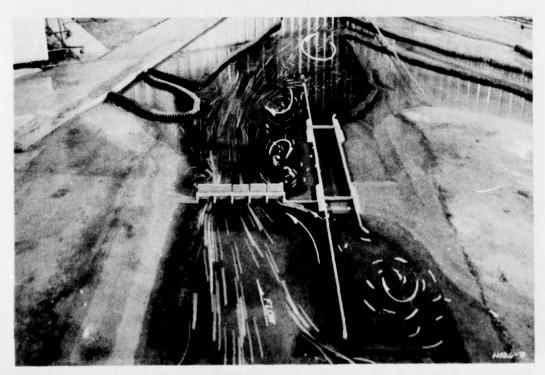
Original plan with discharge of 57,000 cfs and tailwater elevation of 162.1. Note surface currents through the gated spillway and in the lower lock approach
